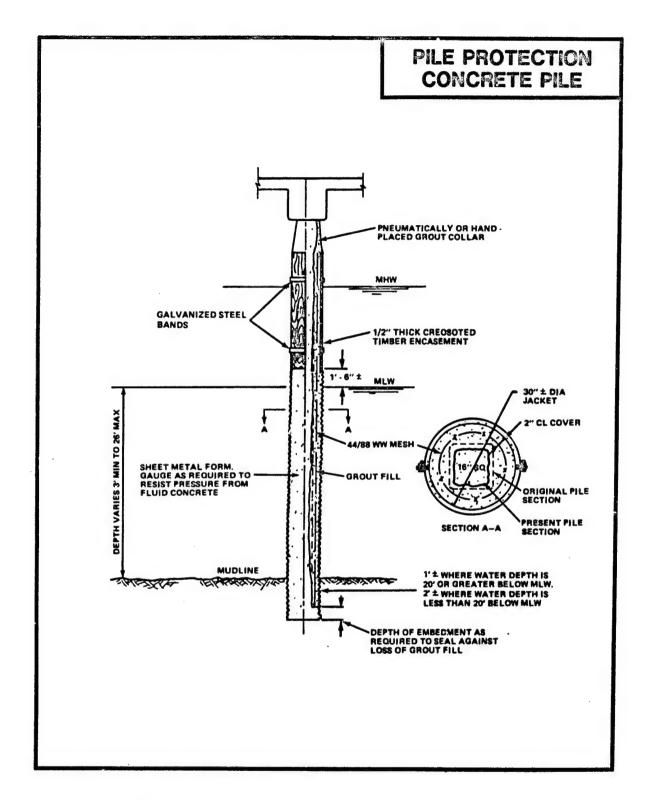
Concrete Jacketing of Concrete Pile (Extracted from reference 7).
